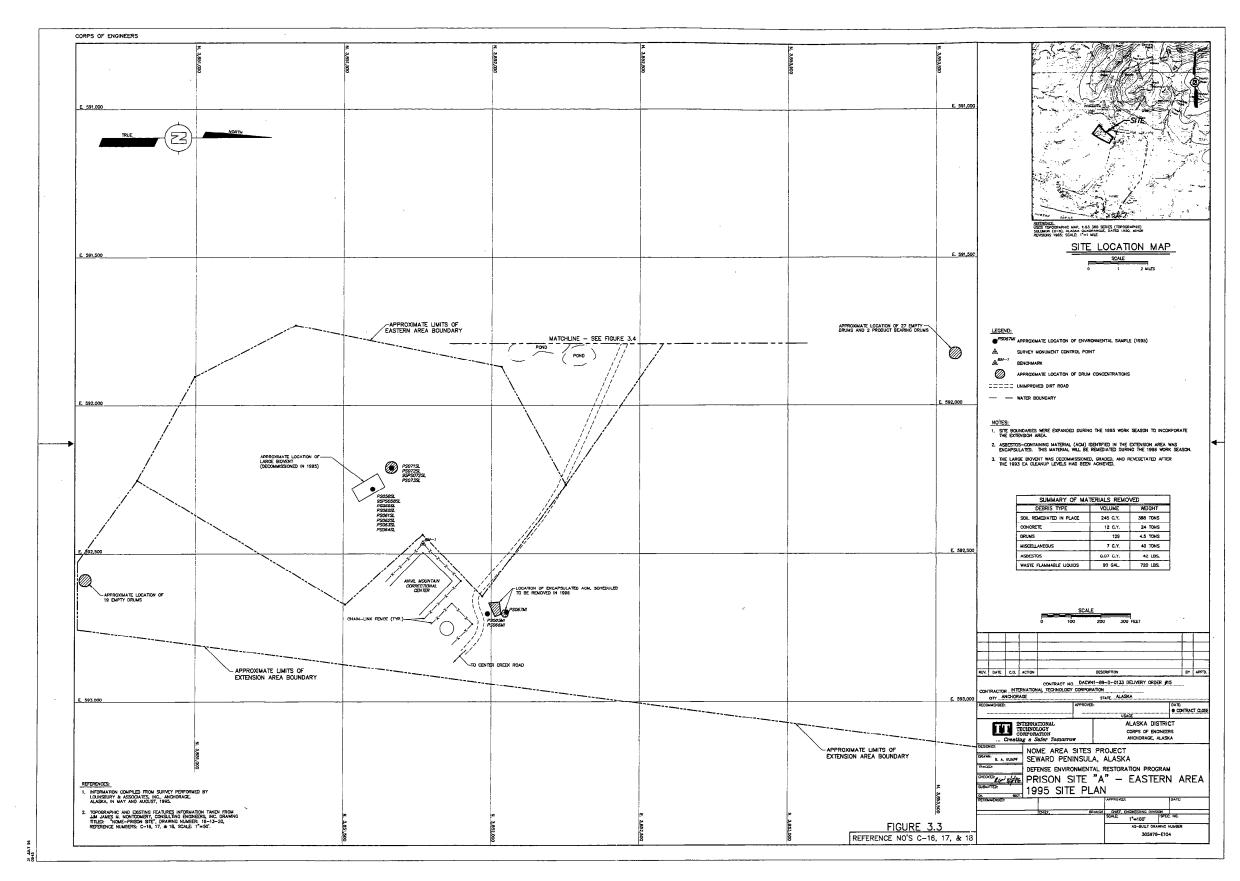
Prison Site 'A' Eastern Area 1995 Site Plan
